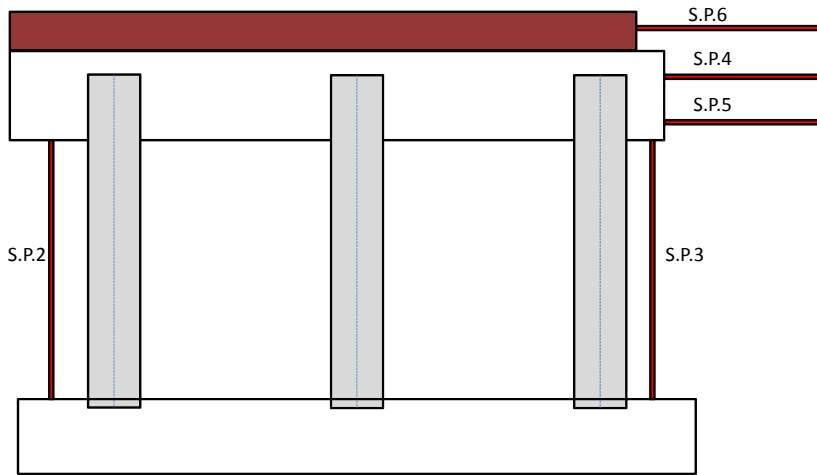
String Potentiometer Locations - Three Pile Specimen
